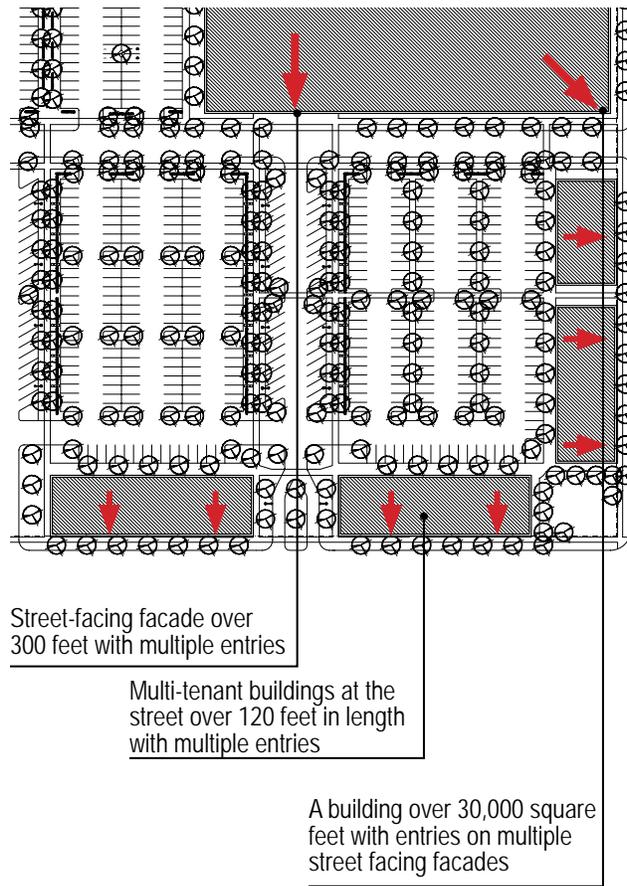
D.4(2): Site diagram illustrating potential entry configuration of multiple buildings on a site.
